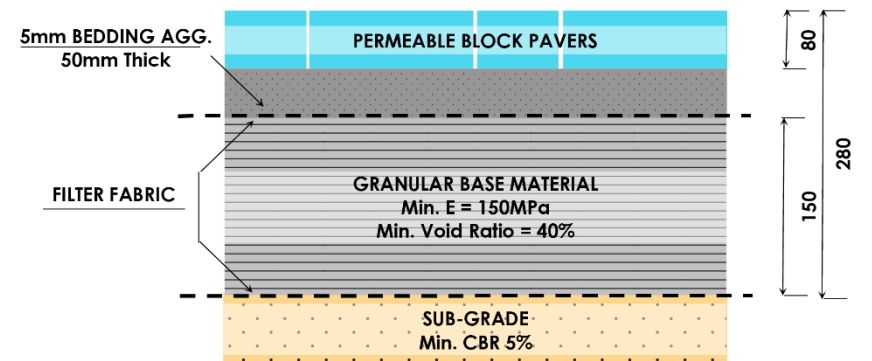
PERMEABLE PAVEMENT DESIGN SECTION
